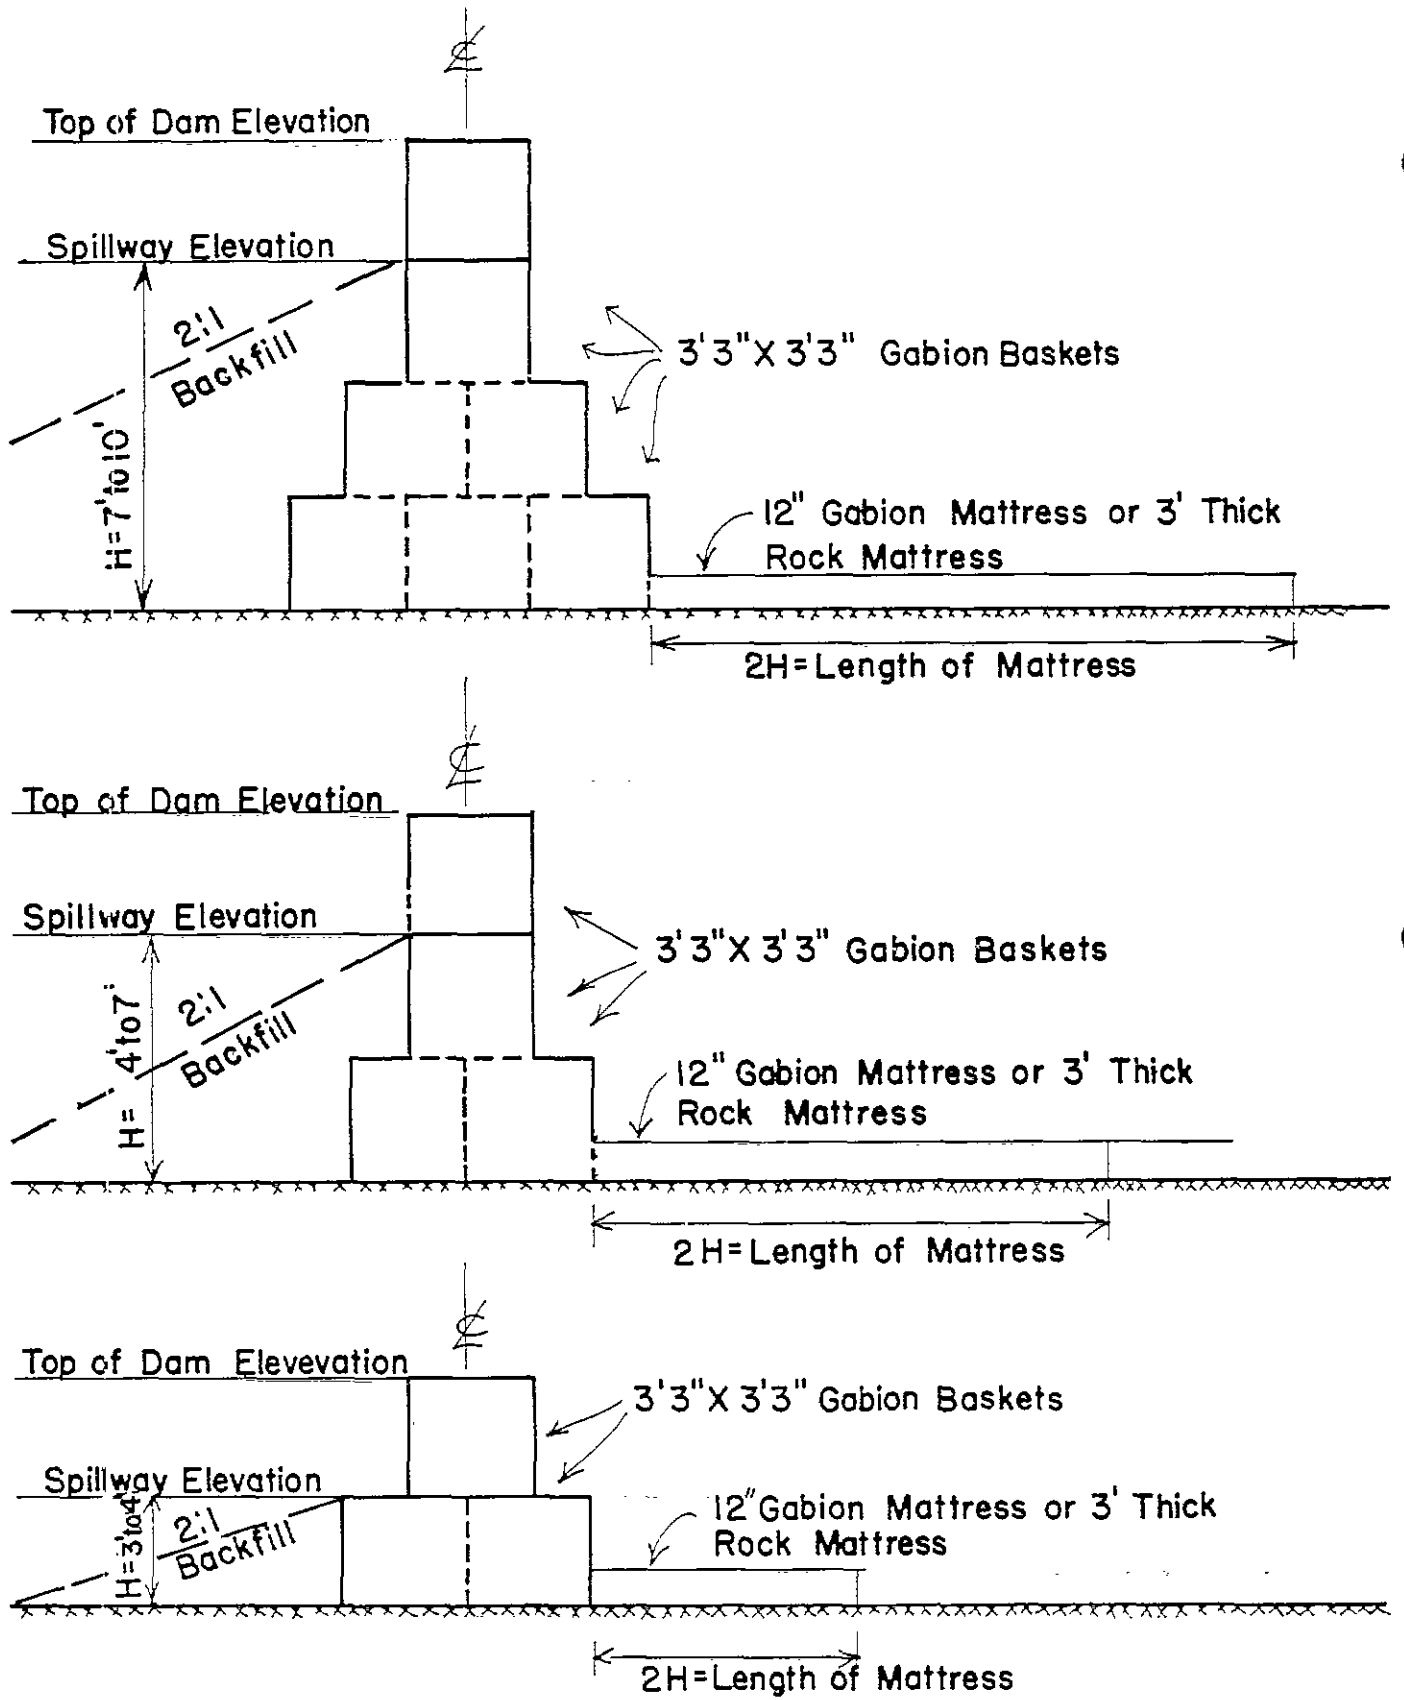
ACCEPTABLE CROSS SECTIONS FOR GABION SEDIMENT DAMS
